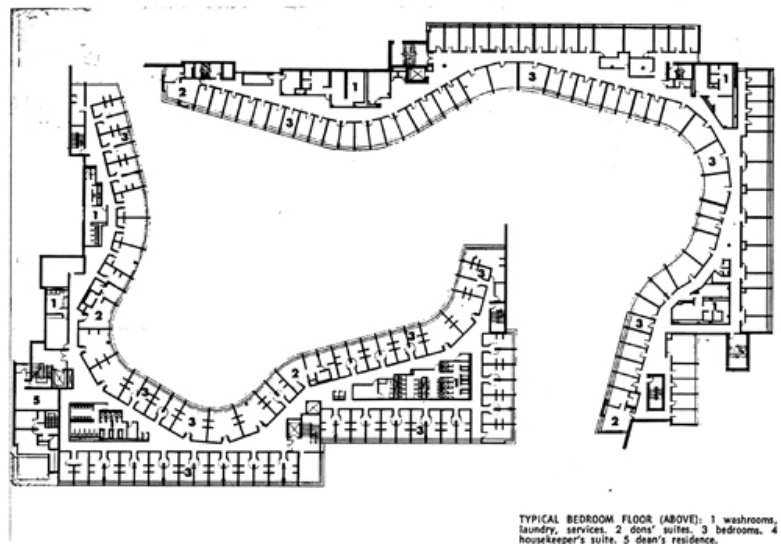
Typical upper-level floor plan of Wetmore Hall (right) and Wilson Hall (left) of New College, UofT. Designed by architect Macy Dubois, they were built in 1964 and 1969 respectively.
